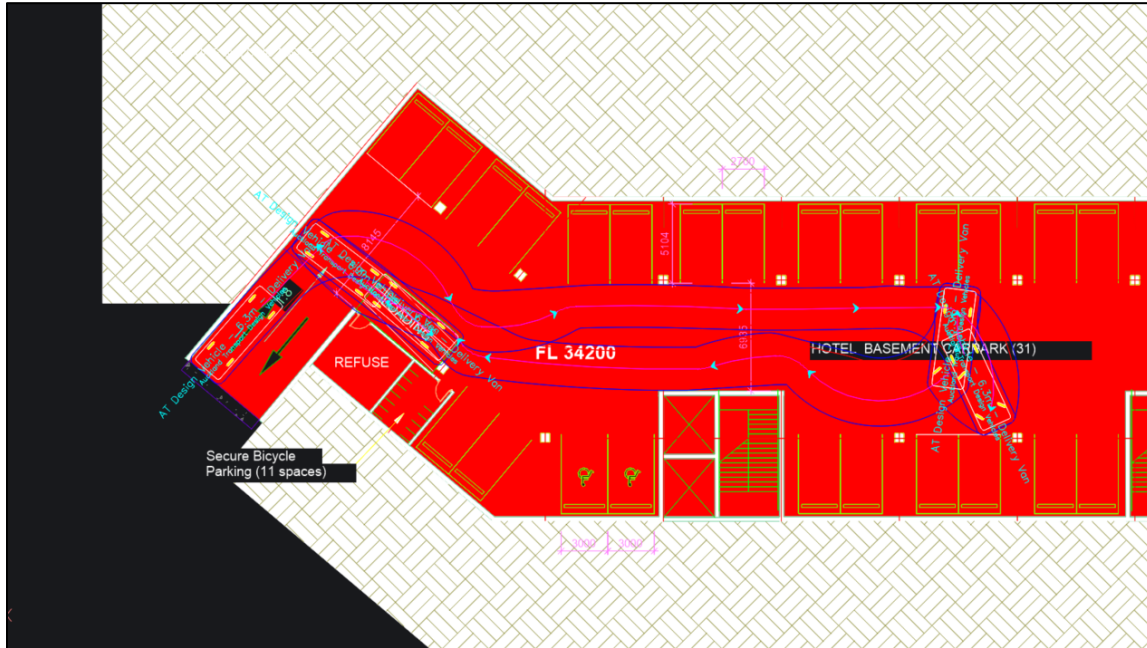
Super lot CM5 - loading space tracking (basement)
